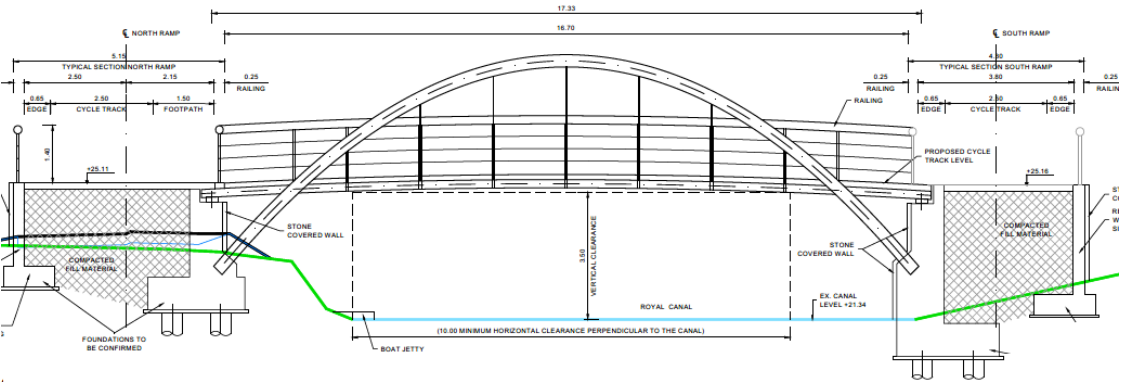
Proposed footbridge for Royal Canal Crossing
